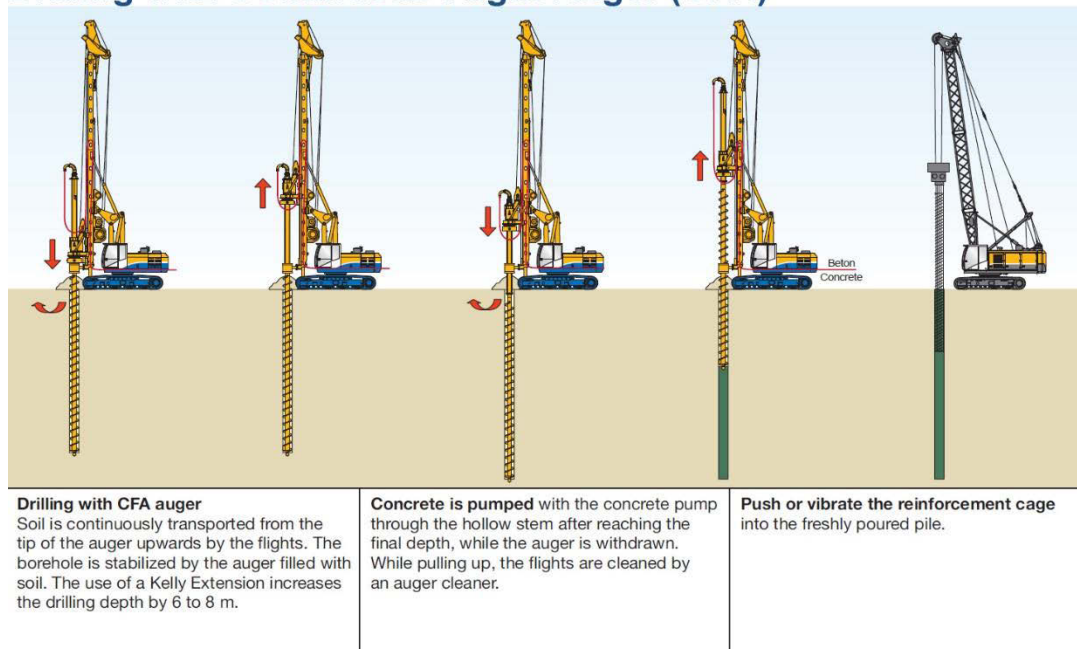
A flight auger system for piling ([www.bauerpileco.com](http://www.bauerpileco.com))
